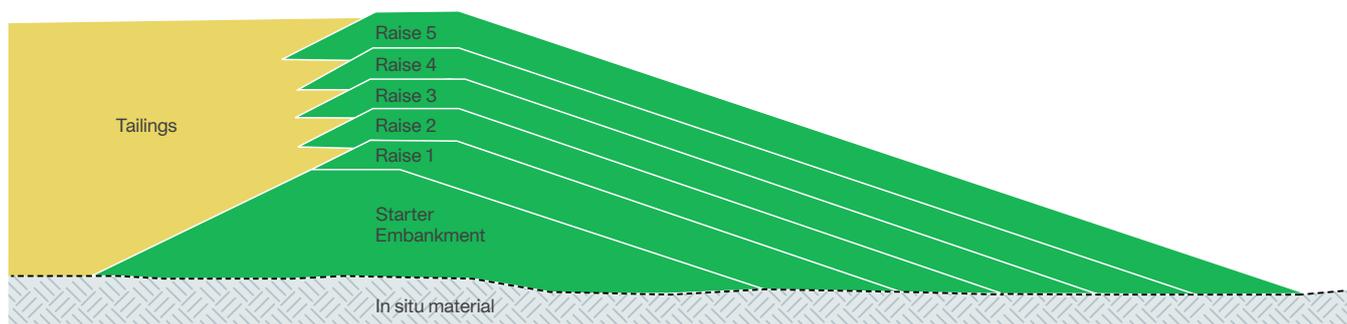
Typical section for Speewah Fluorite Project embankment design showing the modified centreline construction approach.
